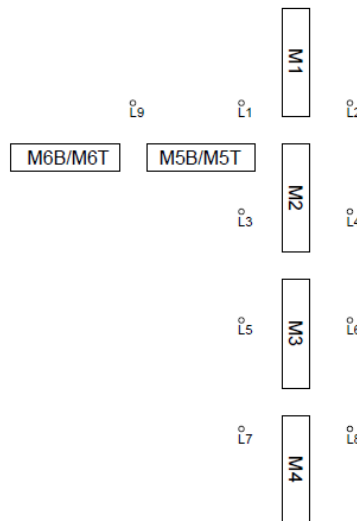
Site layout for sample case study with 8 modules and 9 potential crane locations
